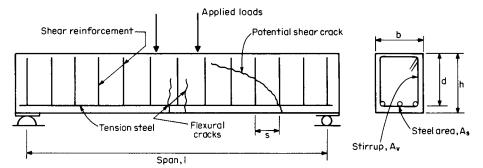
Typical arrangement of reinforcement in beams.
